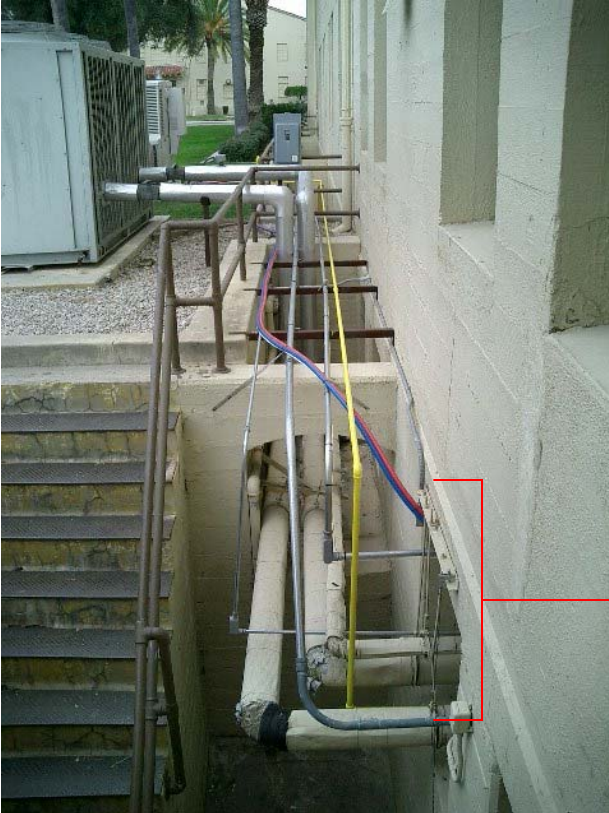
Conduit, Piping, Thermal Recovery Runs
